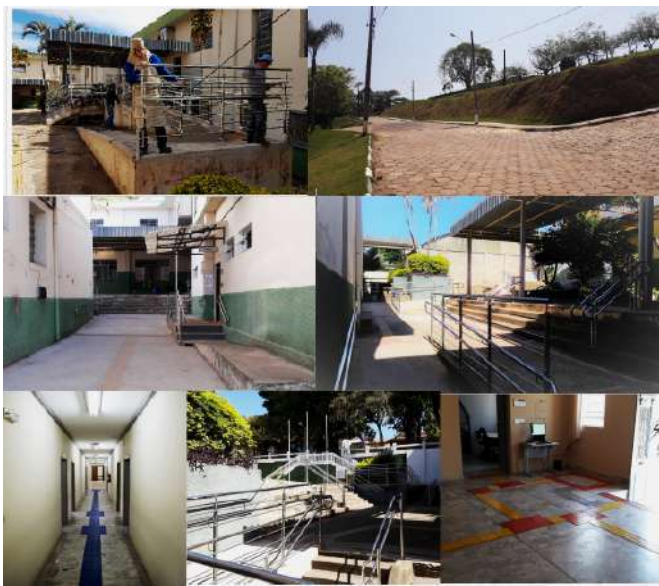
Inconfidentes Campus tactile paving, ramp and handrails.
